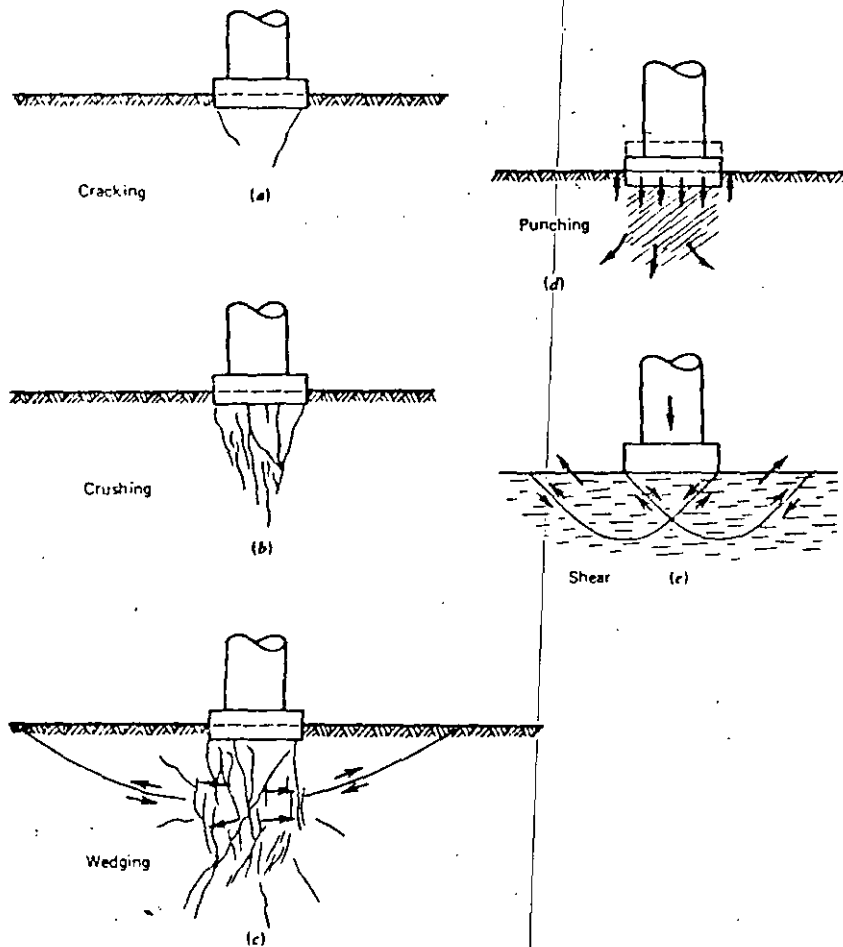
Modes of failure of a footing on rock. (a), (b), and (c) Development of failure through crack propagation and crushing beneath the footing. (d) Punching through collapse of voids. (e) Shear failure.
